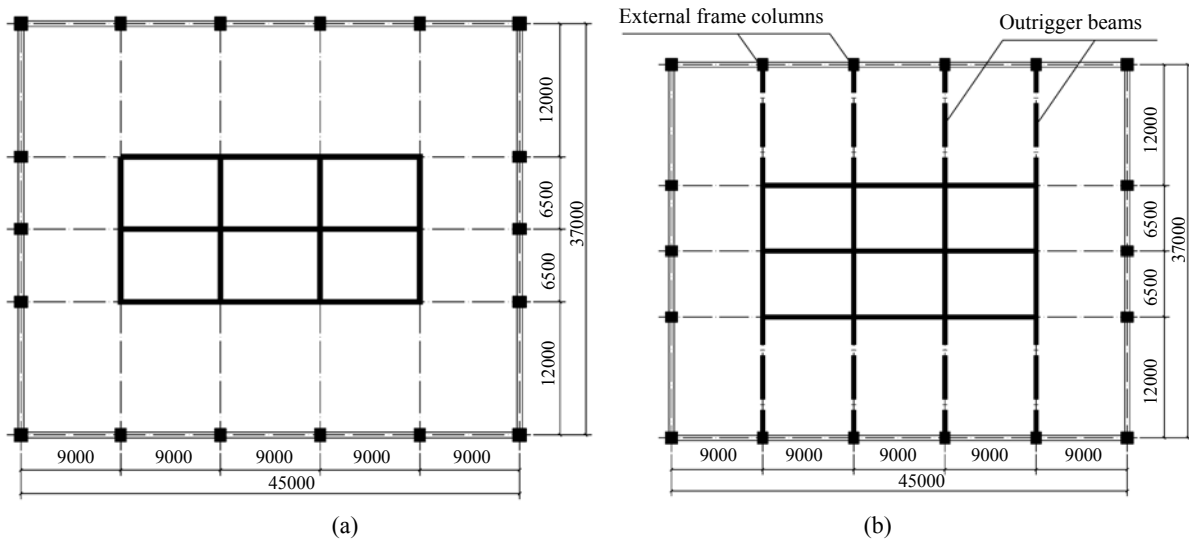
(a) Typical floor plan; (b) Outrigger floor plan (unit: mm)
